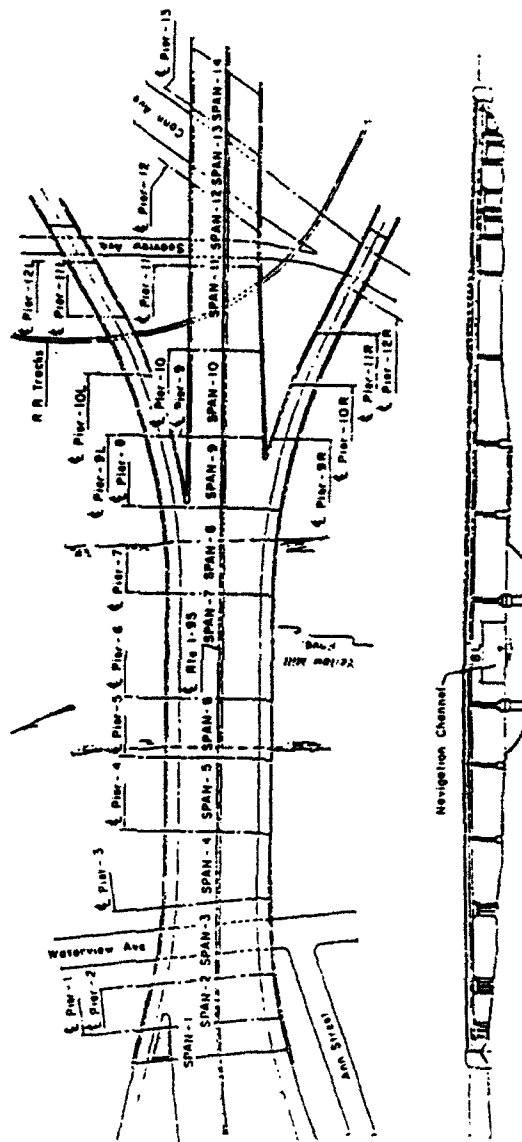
Plan and elevation of Yellow Mill Pond Bridge.
